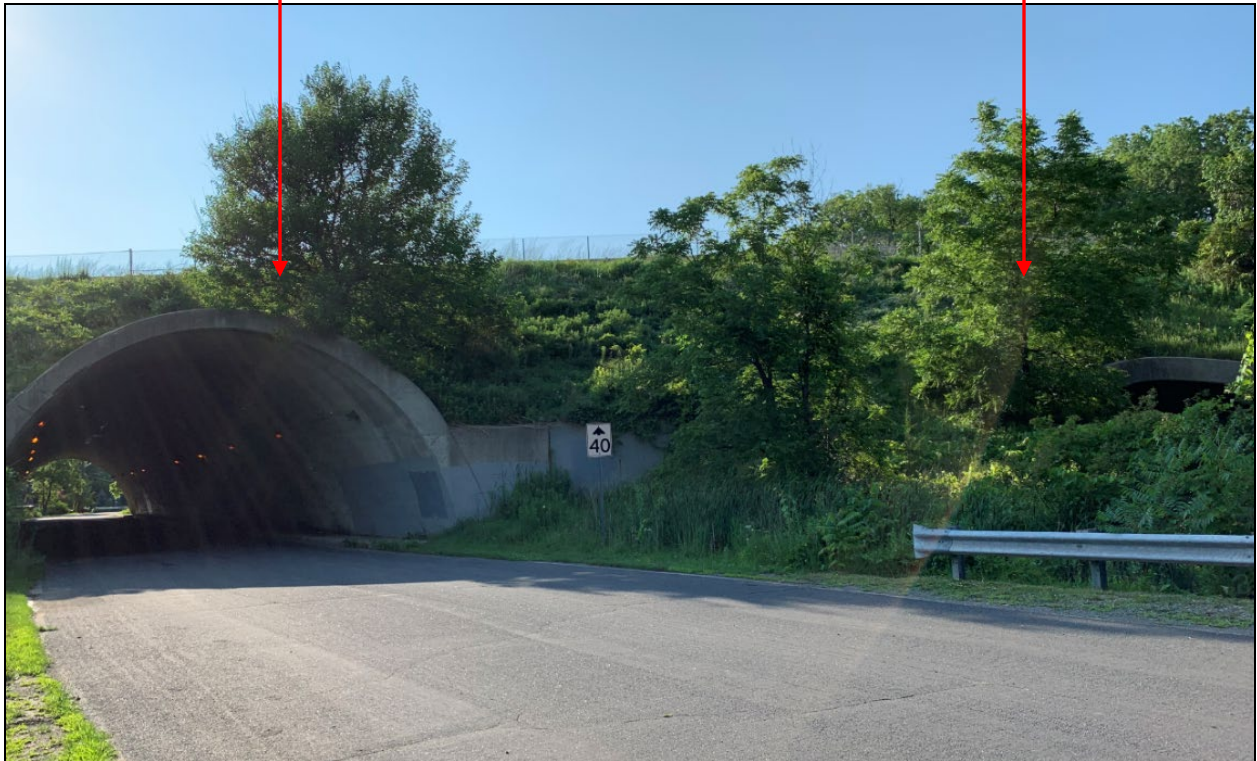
Hidden Valley Road culvert and Grindstone Creek culvert, south side
